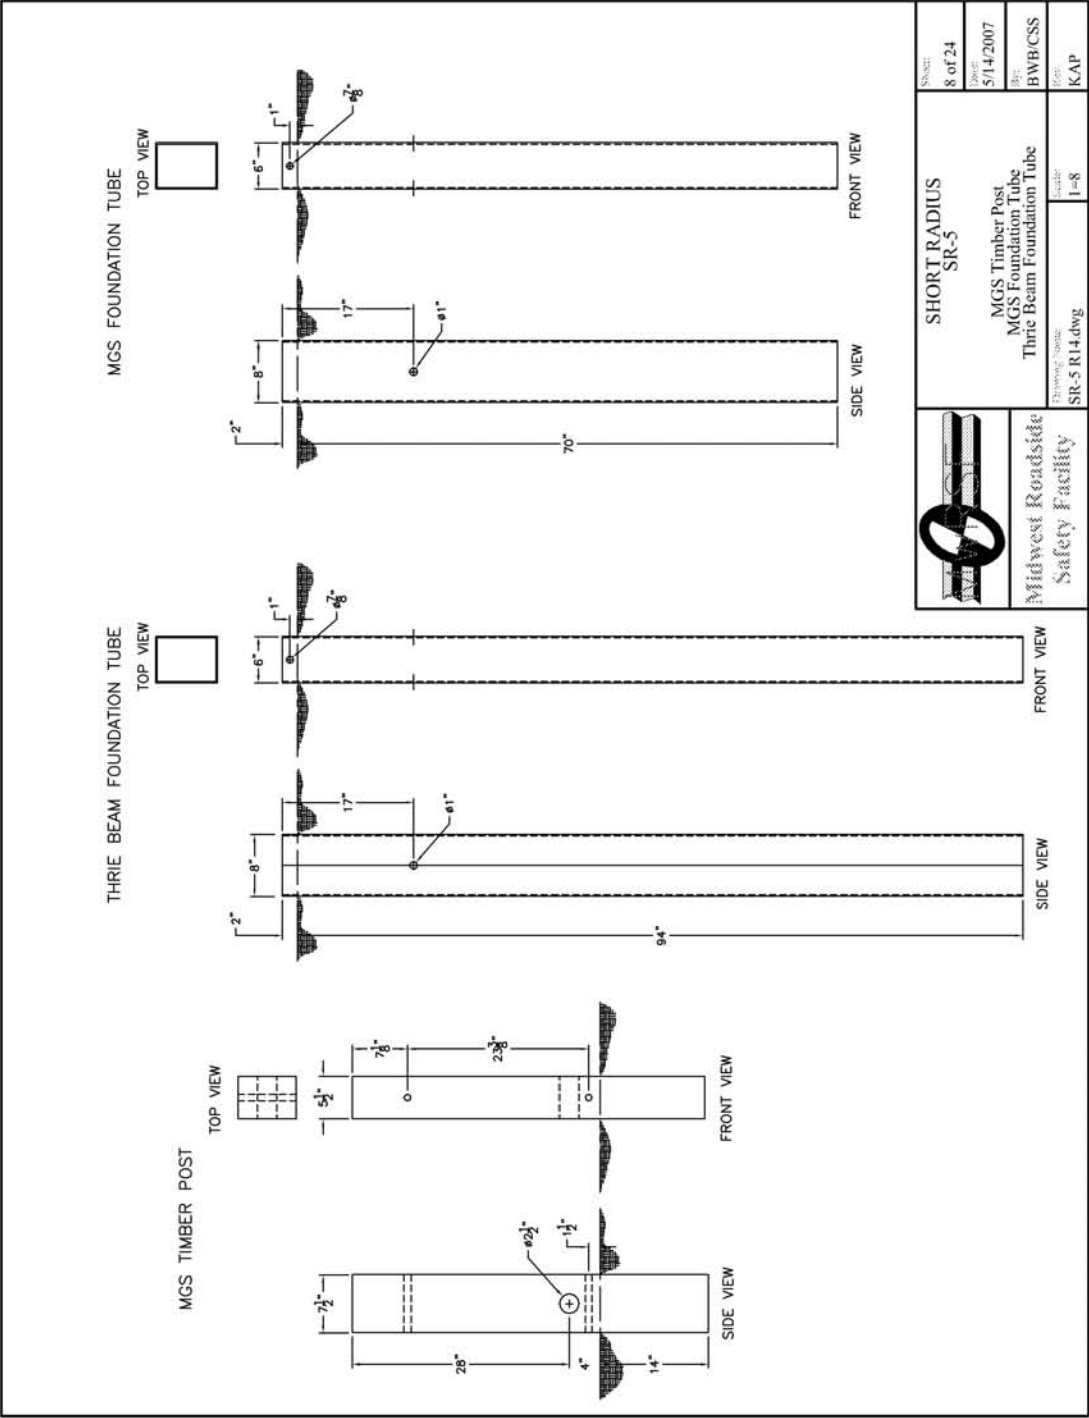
MGS and Thrie Beam Foundation Tube Details (English), Test SR-5
